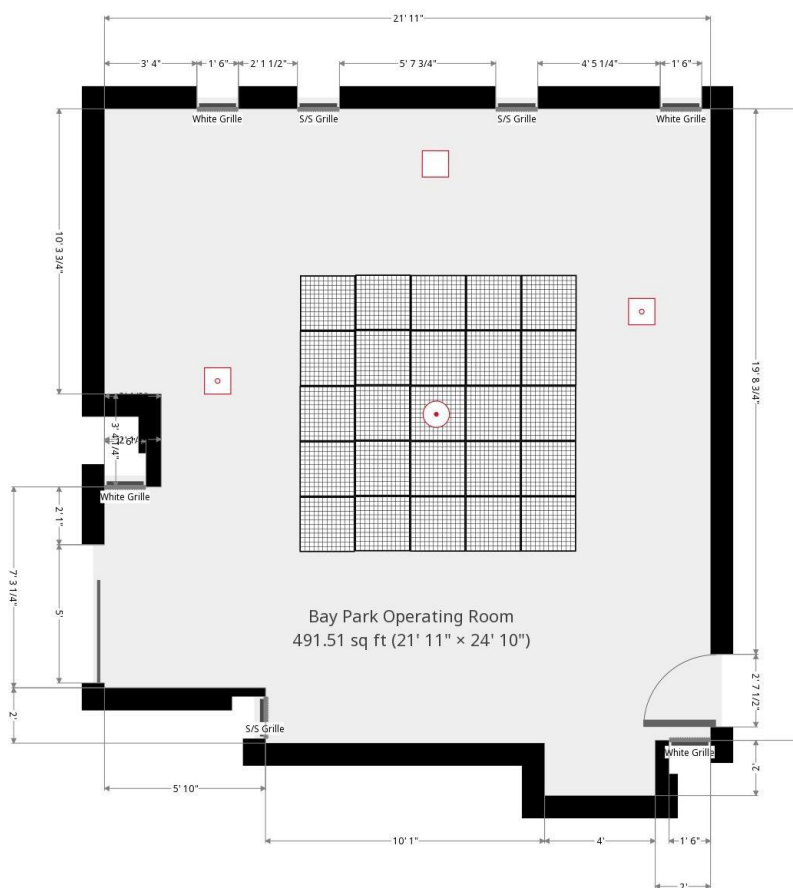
BAY PARK OR #3 OBSERVED PLAN LAYOUT
